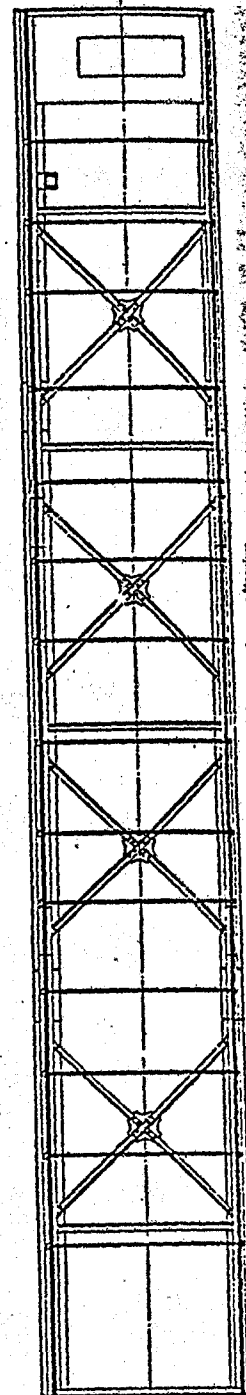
Plan of Bottom of Furnace, showing Heating.
